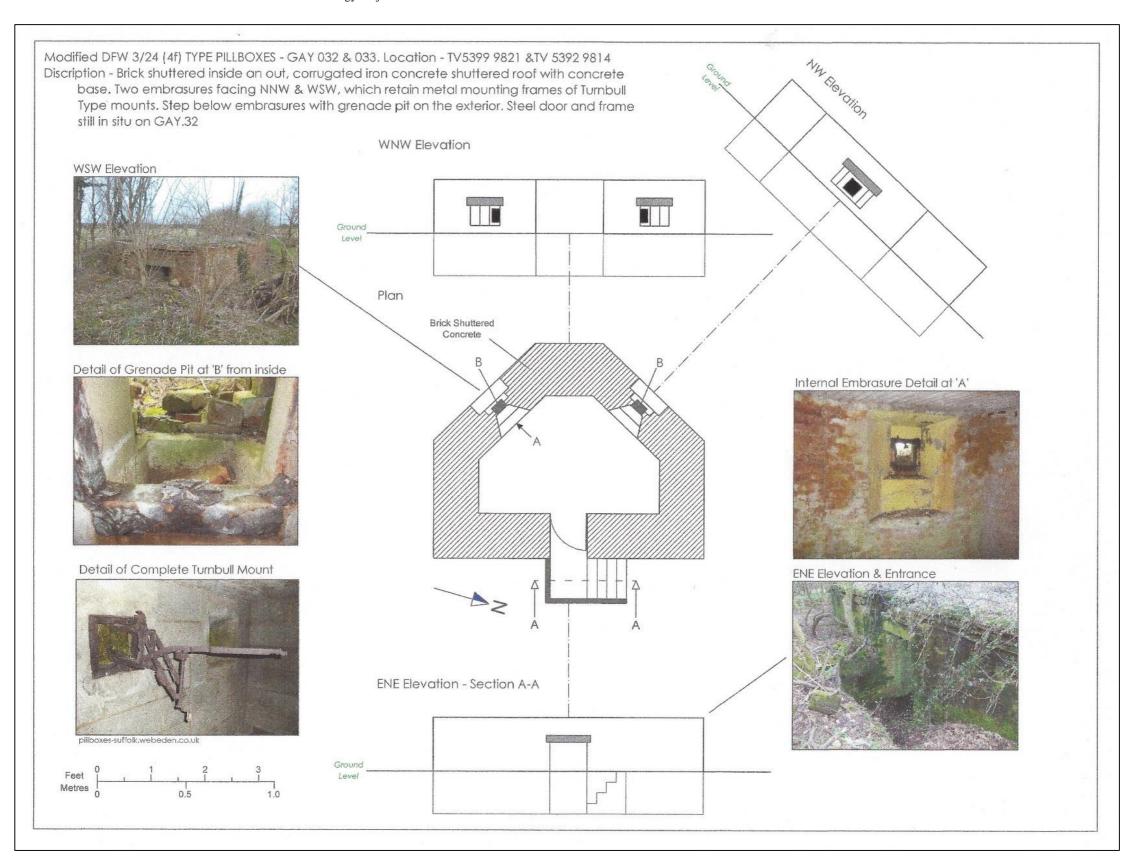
Plan and Elevations of Pillboxes GAY032 & 033
